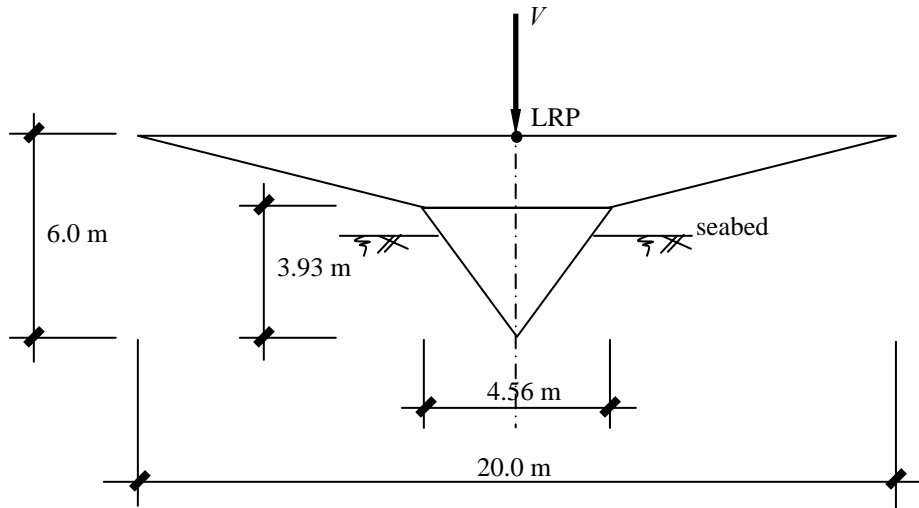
Geometry of the spudcan footing considered in Example 3
